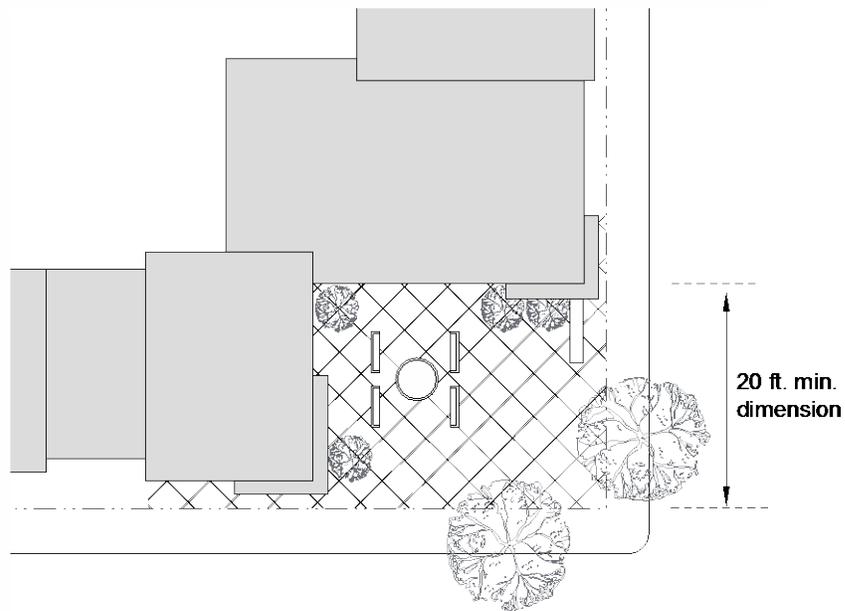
D.1.c: MINIMUM REQUIRED PUBLIC PLAZA DIMENSION
